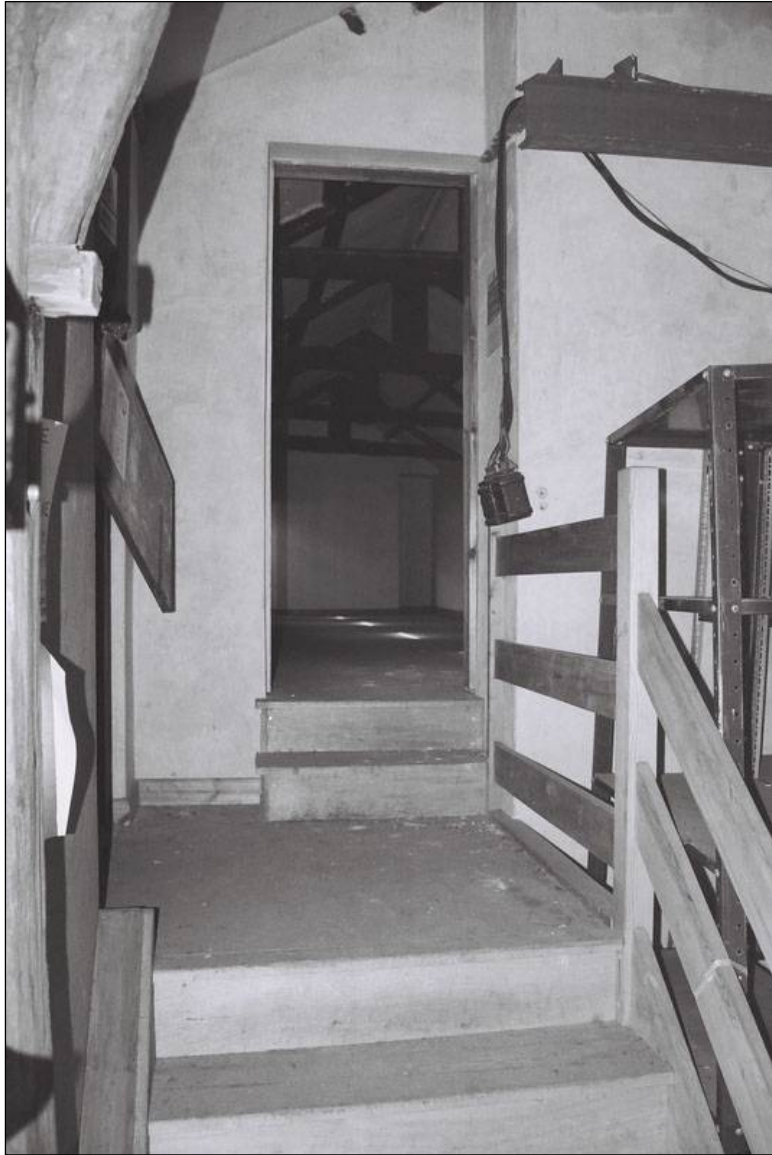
Room S5, detail of doorway to room S4 and change in floor level (film 1.24)
